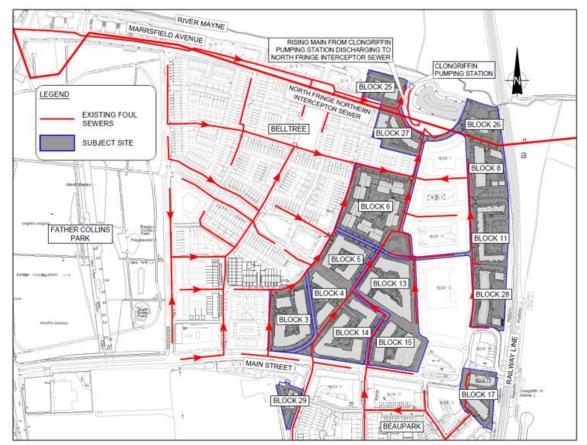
Existing and Proposed Wastewater Drainage Layout
